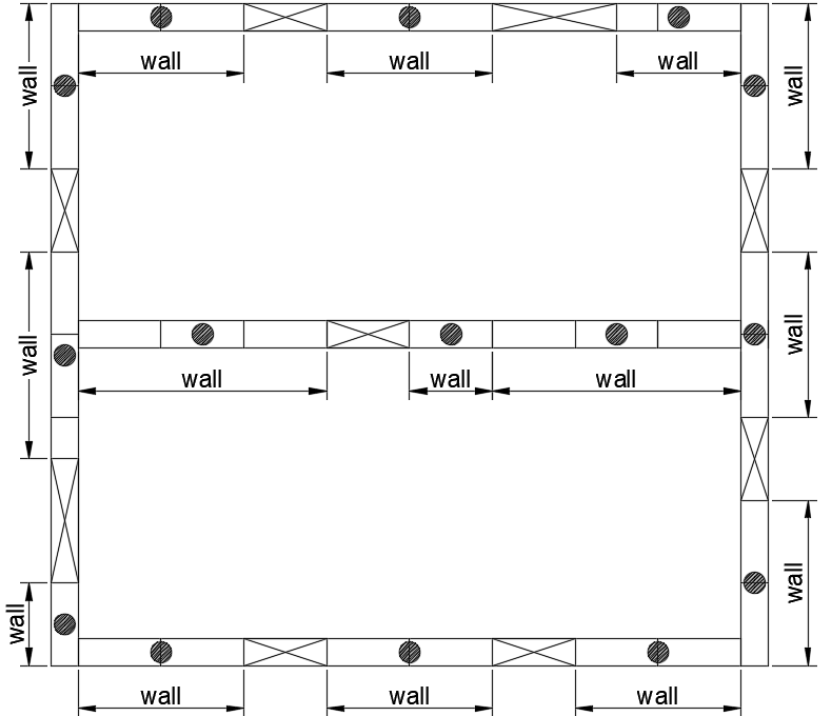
Modeling Details of Second Story Walls of the Project Building
